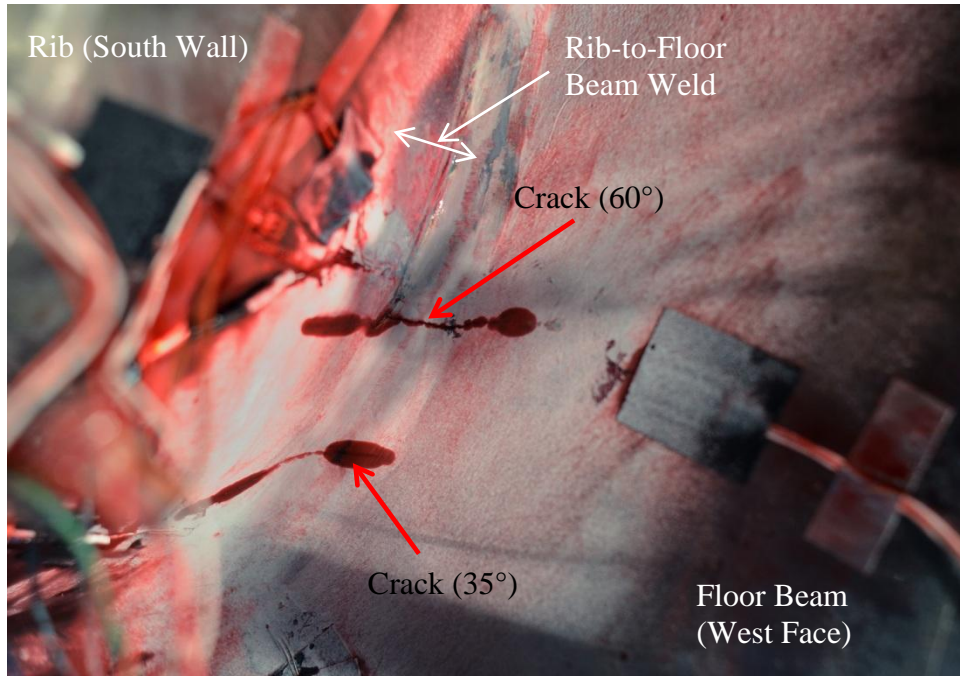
Crack at the floor beam-to-rib welded connection in the mock-up specimen MU3 – south west
